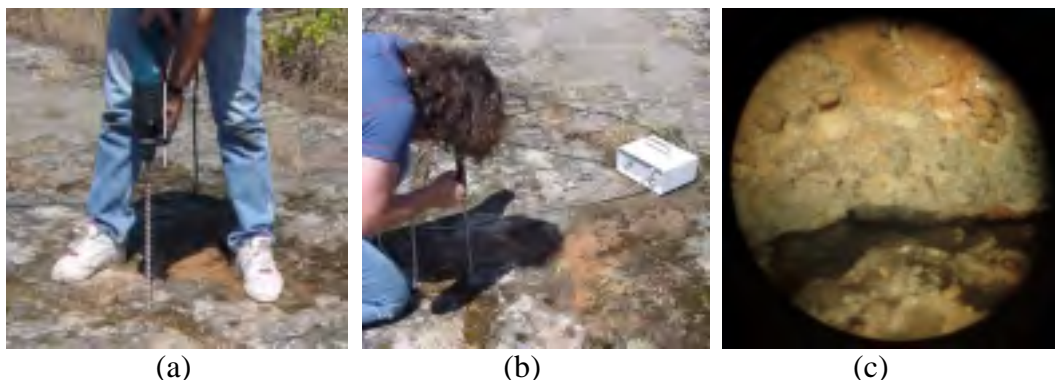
Aspects of the inspection with rigid endoscope: (a) drilling machine
